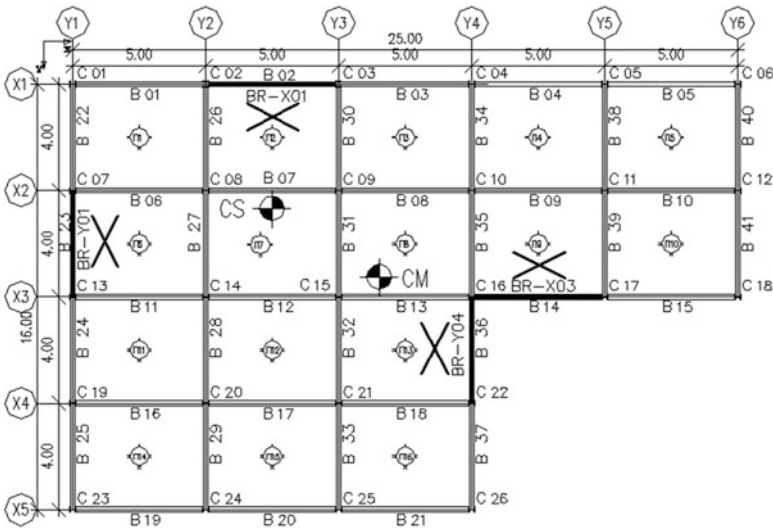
Layout of the three-story torsionally flexible steel building
